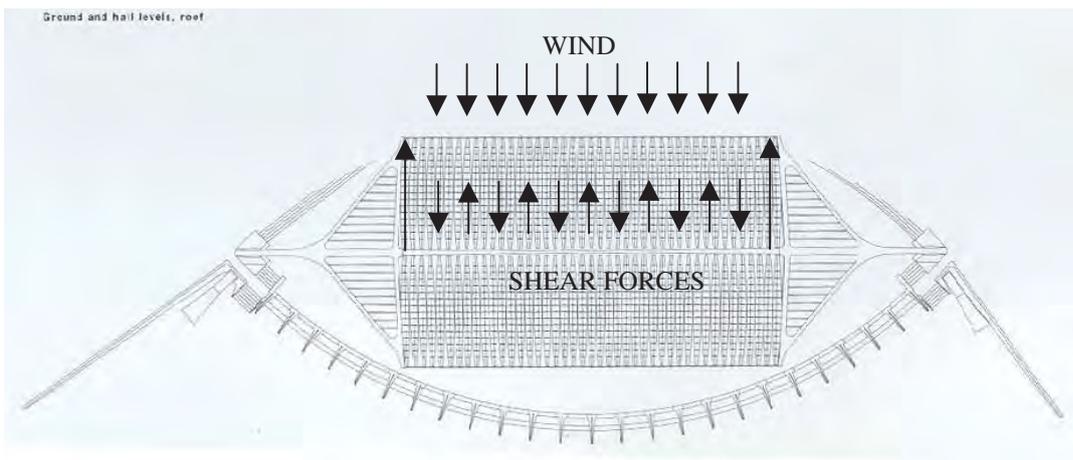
Roof Plan, Asymetric Loads (horizontal component of wind loads) Tenerife Exhibition Center, 1992
